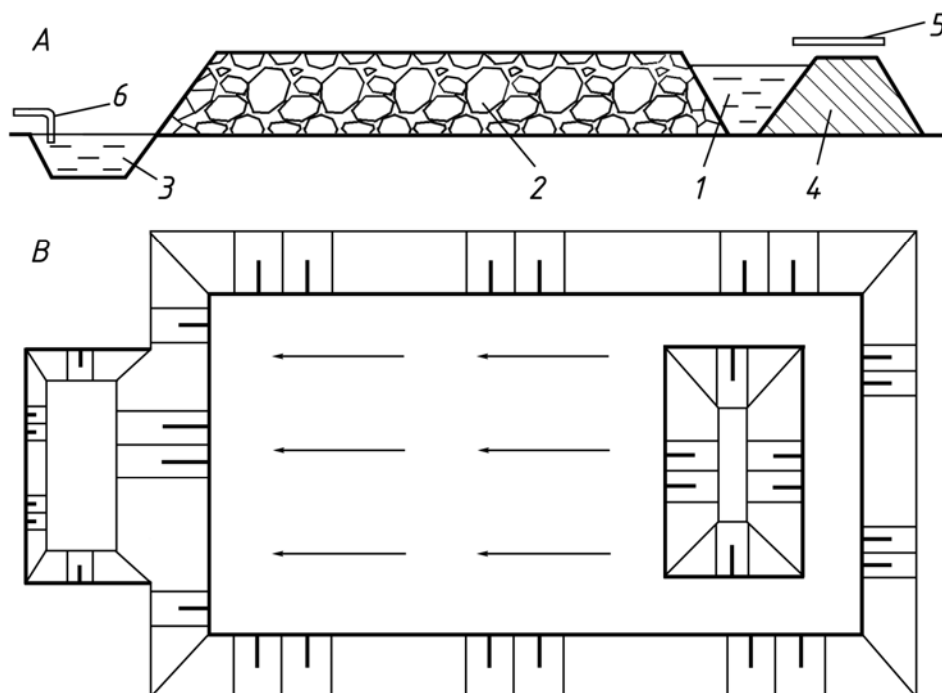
Artificial filtering array on the flat surface: A – longitudinal section; B – plan view; 1 – receiver for contaminated water; 2 – filtering array; 3 – lodgment of purified water; 4 – water retention levee; 5 – conduit for feeding for contaminated water; 6 – conduit for purified water removing.
